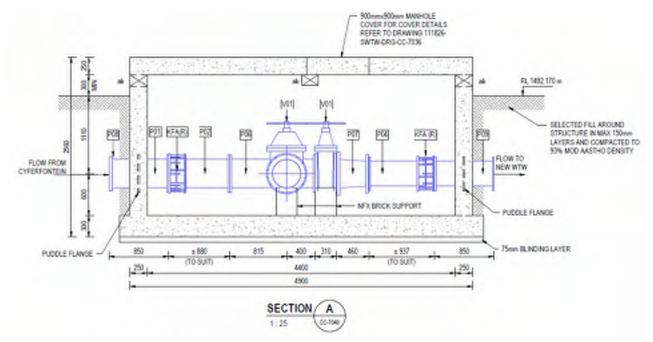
Sectional View of Bi-Directional Diversion Chambe
